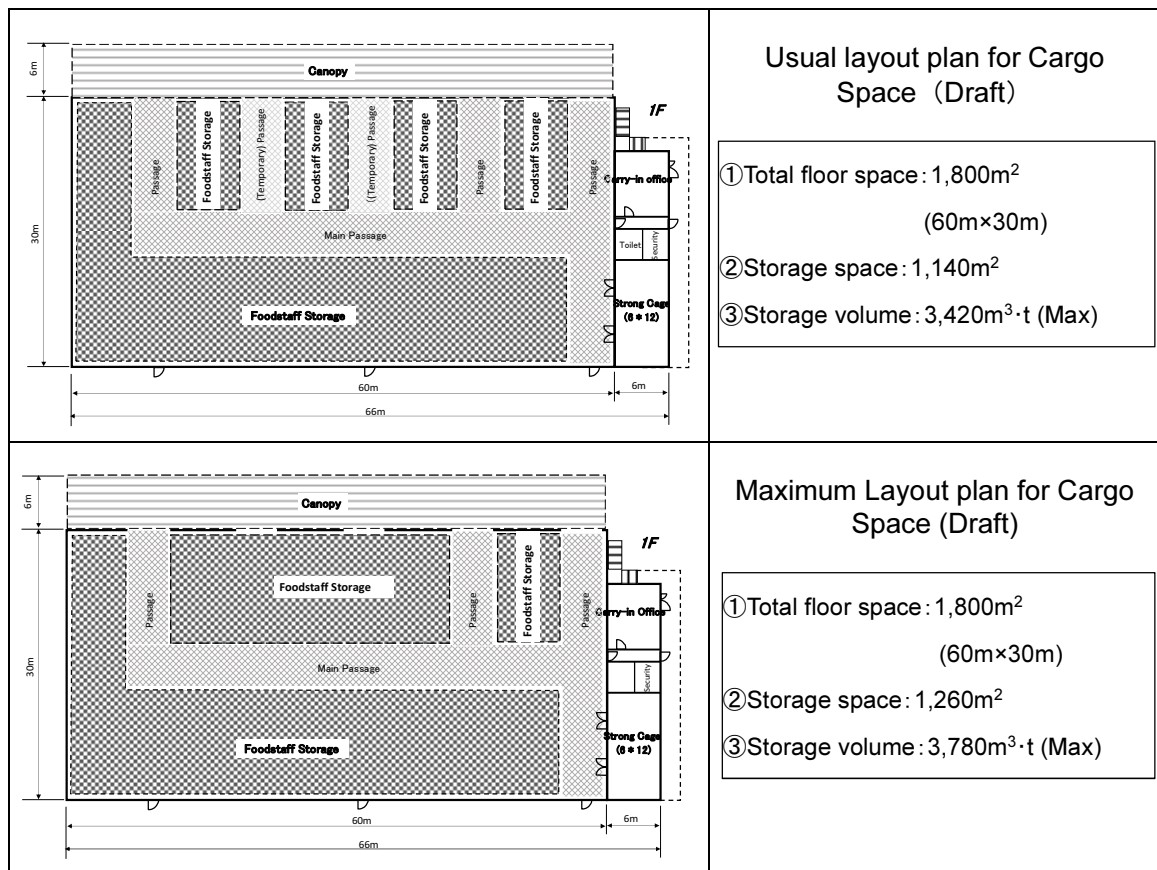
Storing Space of New General Cargo Warehouse
